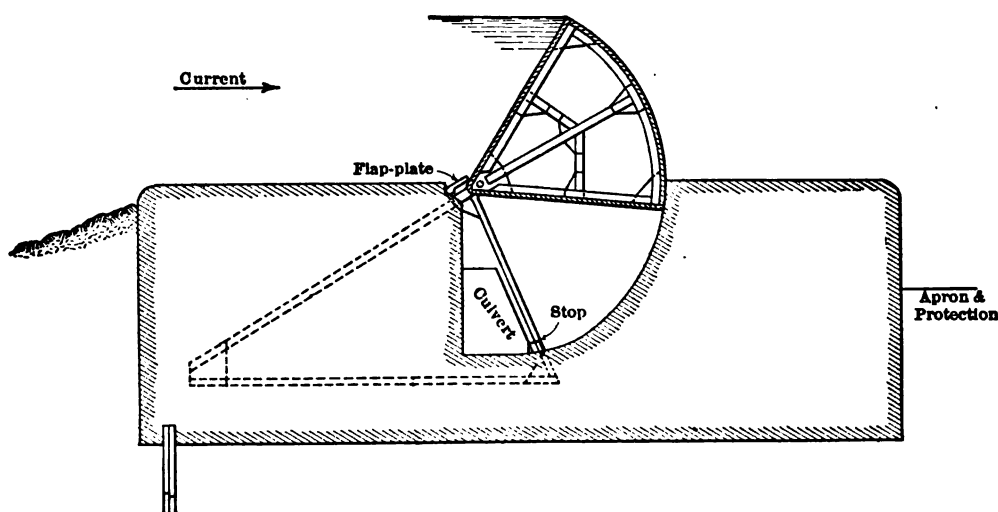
Typical Section of a Chittenden Drum Wicket.
